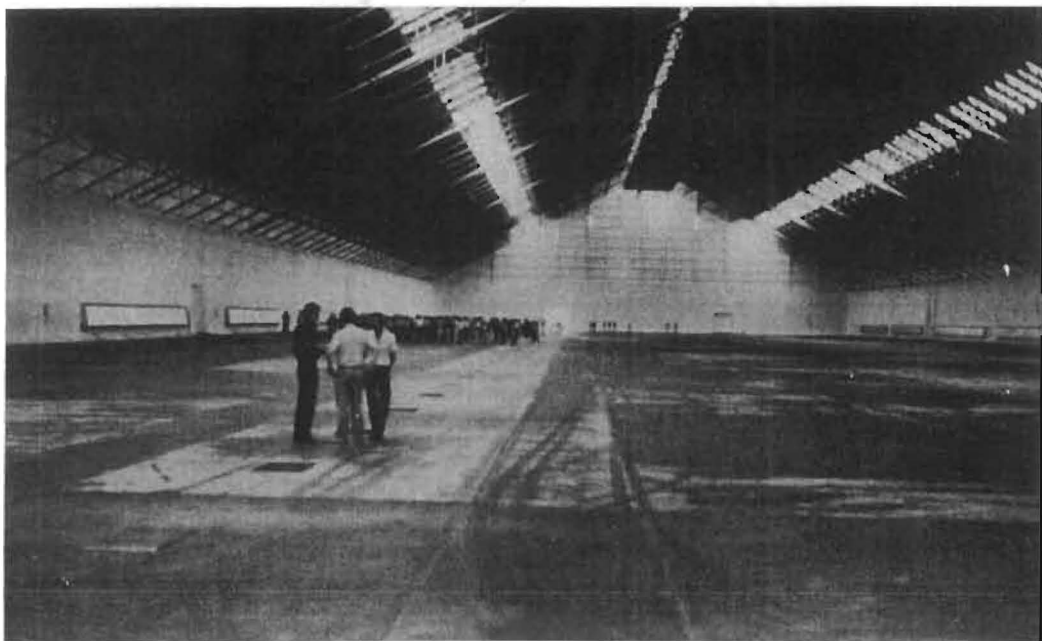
An interior view of the No. 1 horizontal storage at Kwinana.
